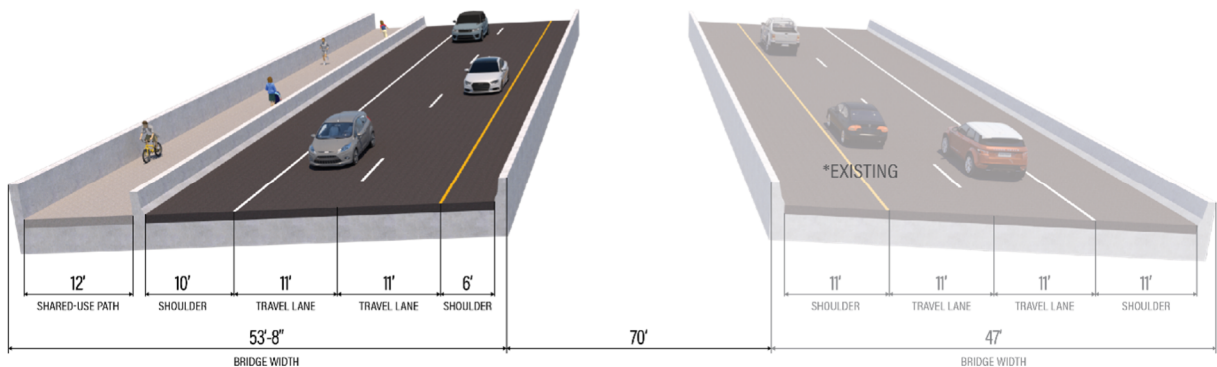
Suburban Typical Section (Segments 1, 4, and 6)
